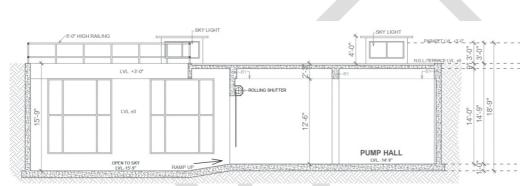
Proposed Section B-B of the HVAC structures near the Secretariat Building © Engineering Department Union Territory Chandigarh
